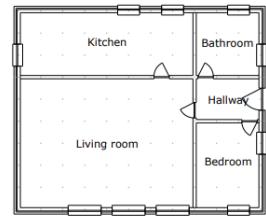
Example of a relatively simple floor plan including four rooms and a hallway.
